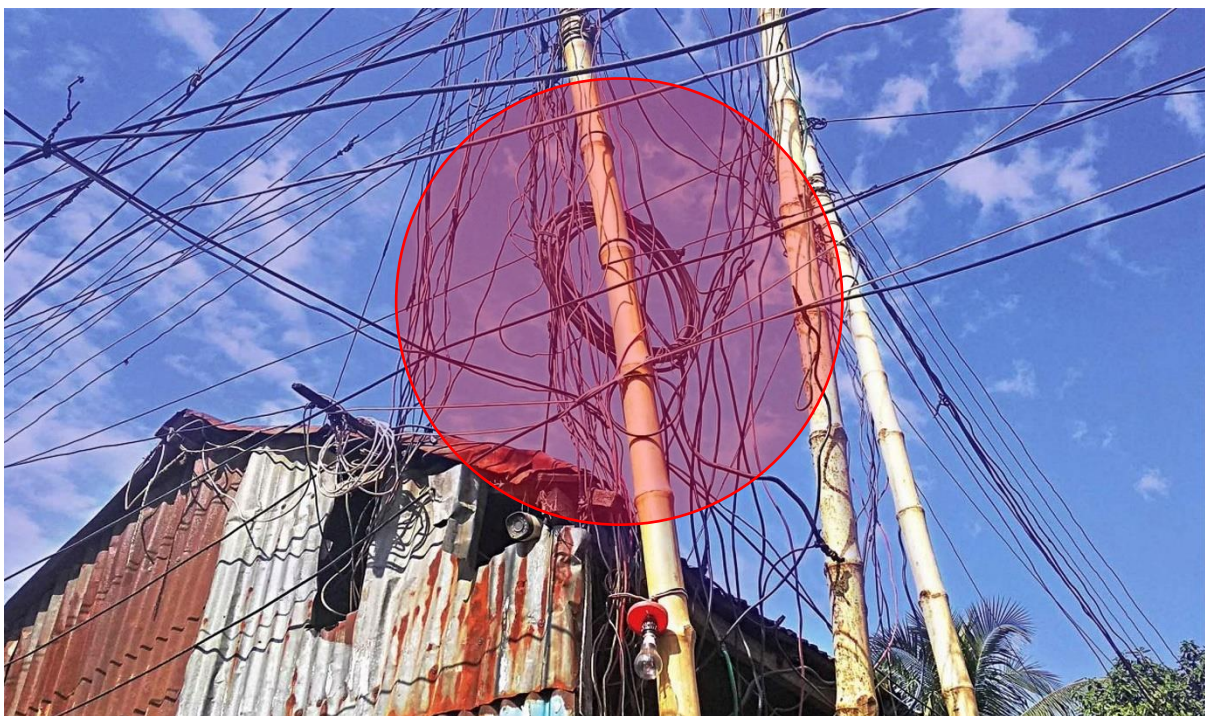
Illegal faulty electrical wire connection at Korail slum, Dhaka, Bangladesh (Mollah & Saad, 2021)
